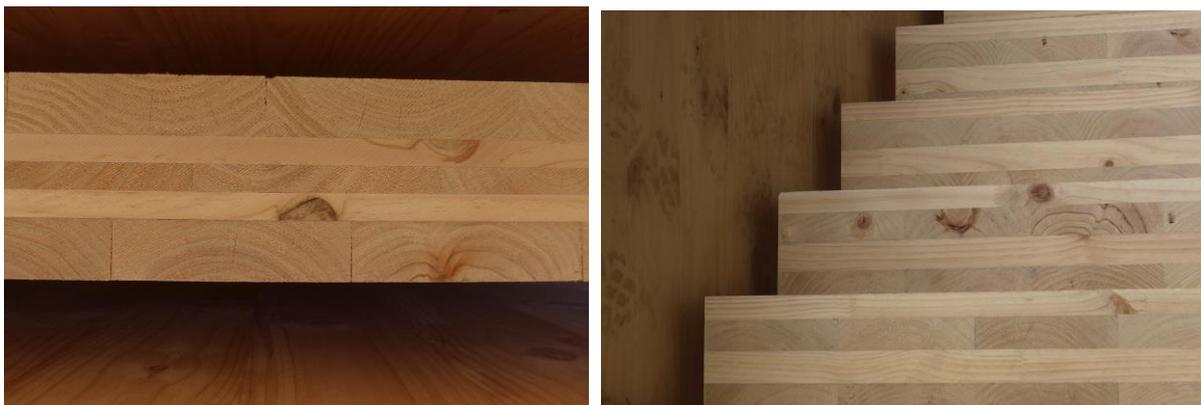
CLT section (L) and CLT in stairwell (R). (Source – XLAM, 2017).
